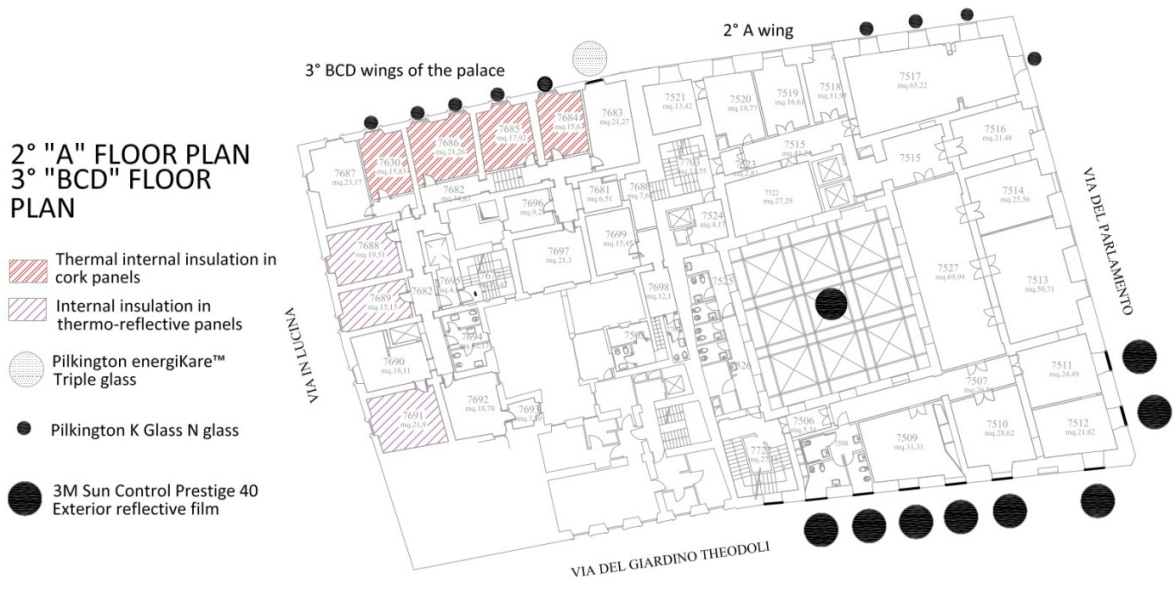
Interventions implemented in second floor of A wing (main body facing Via del Parlamento) and Third floor of BCD wings
